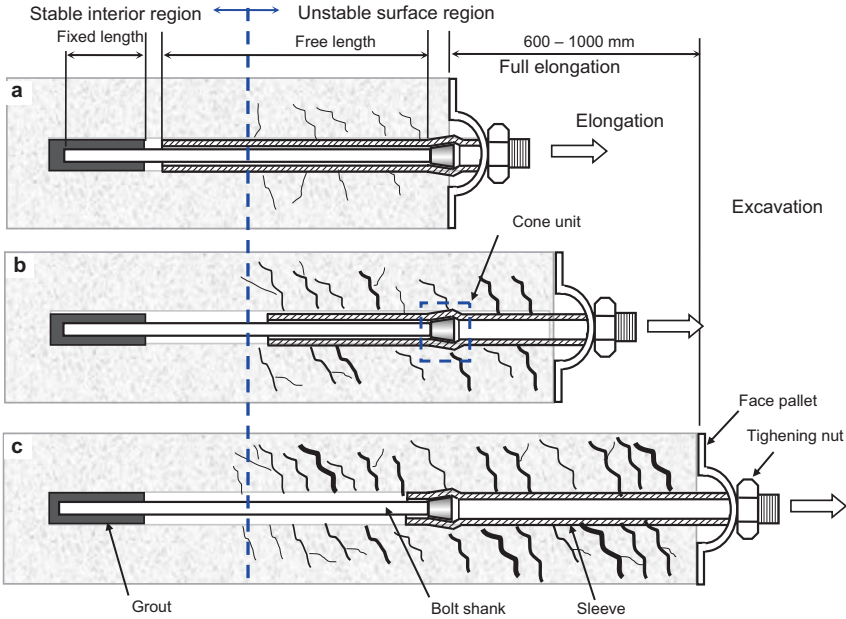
Working principle of the NPR bolt in stabilizing the surrounding rock mass (He et al. 2014): (a) installation of the NPR bolt; (b) working state when rock mass undergoes deformation, and (c) retaining rock mass deformation at full elongation
